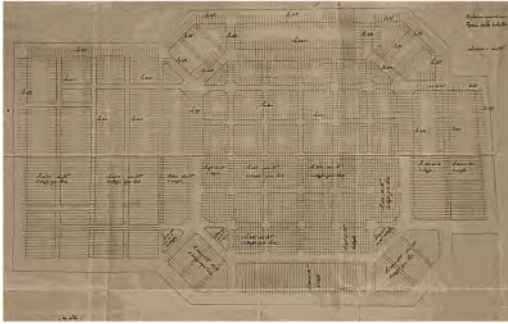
Structural layout plan of the foundation, with the signature of Eng. Lambertini (private collection).
